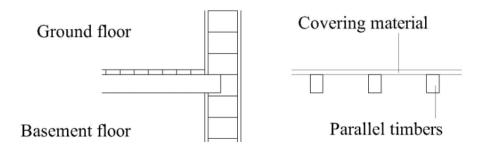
Floor in House 3, House 4 and House 6 (Author, 2012)
